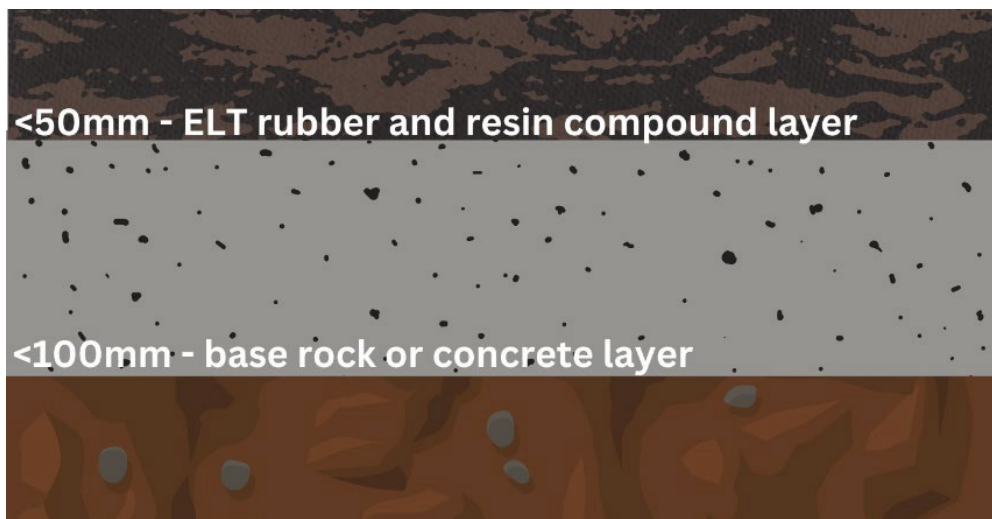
Synthetic Playground and Athletic Track Surface- cross section ground layer diagram
